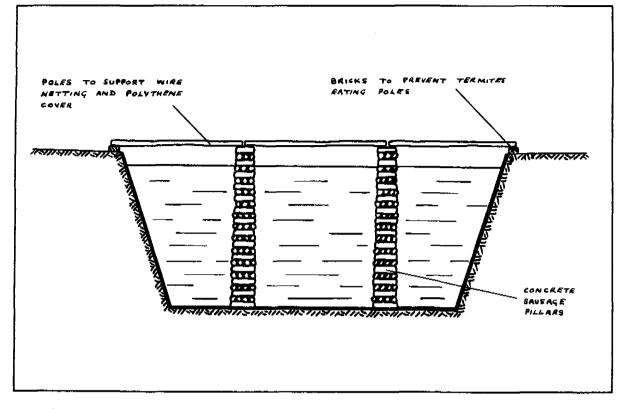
Cross-section of a Tank showing the use of Concrete Sausage Pillars to support the Cover.
